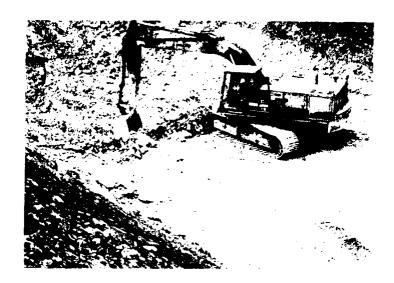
Excavating andesite bedrock in Stage I core trench using Catepillar 235 excavator, vicinity station 31+10. 22 December 1983
